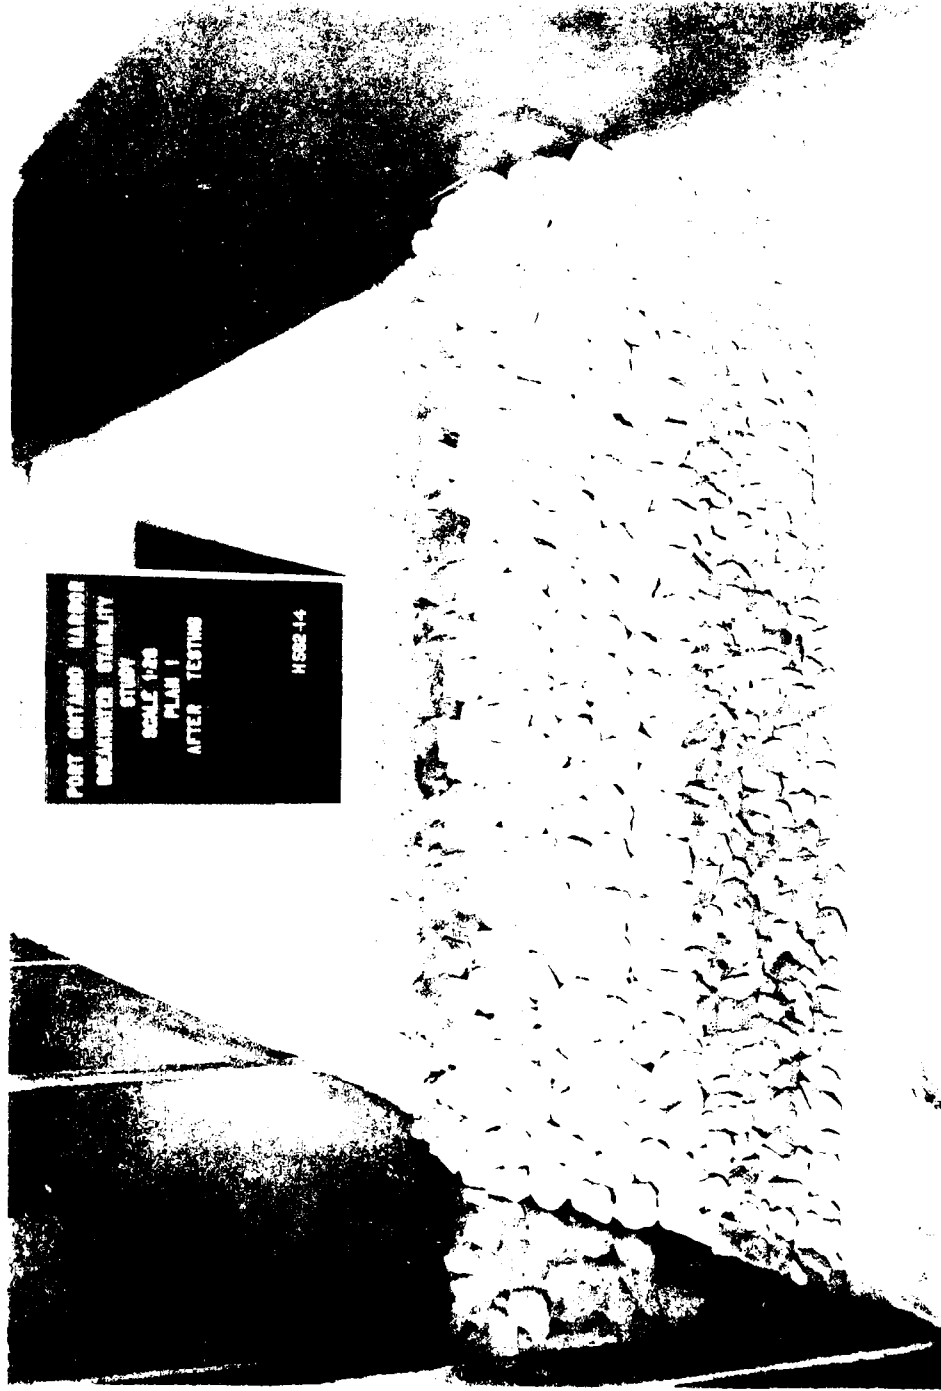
Lakeside view of Plan 1 after completion of storm-surge hydrograph
